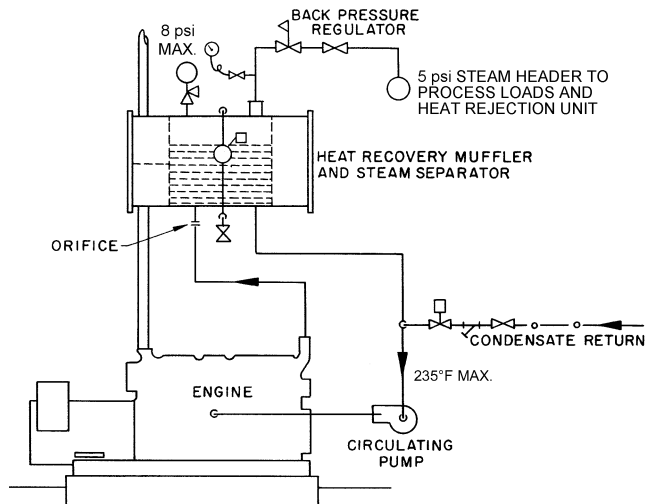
Hot-Water Engine Cooling with Steam Heat Recovery (Forced Recirculation)
